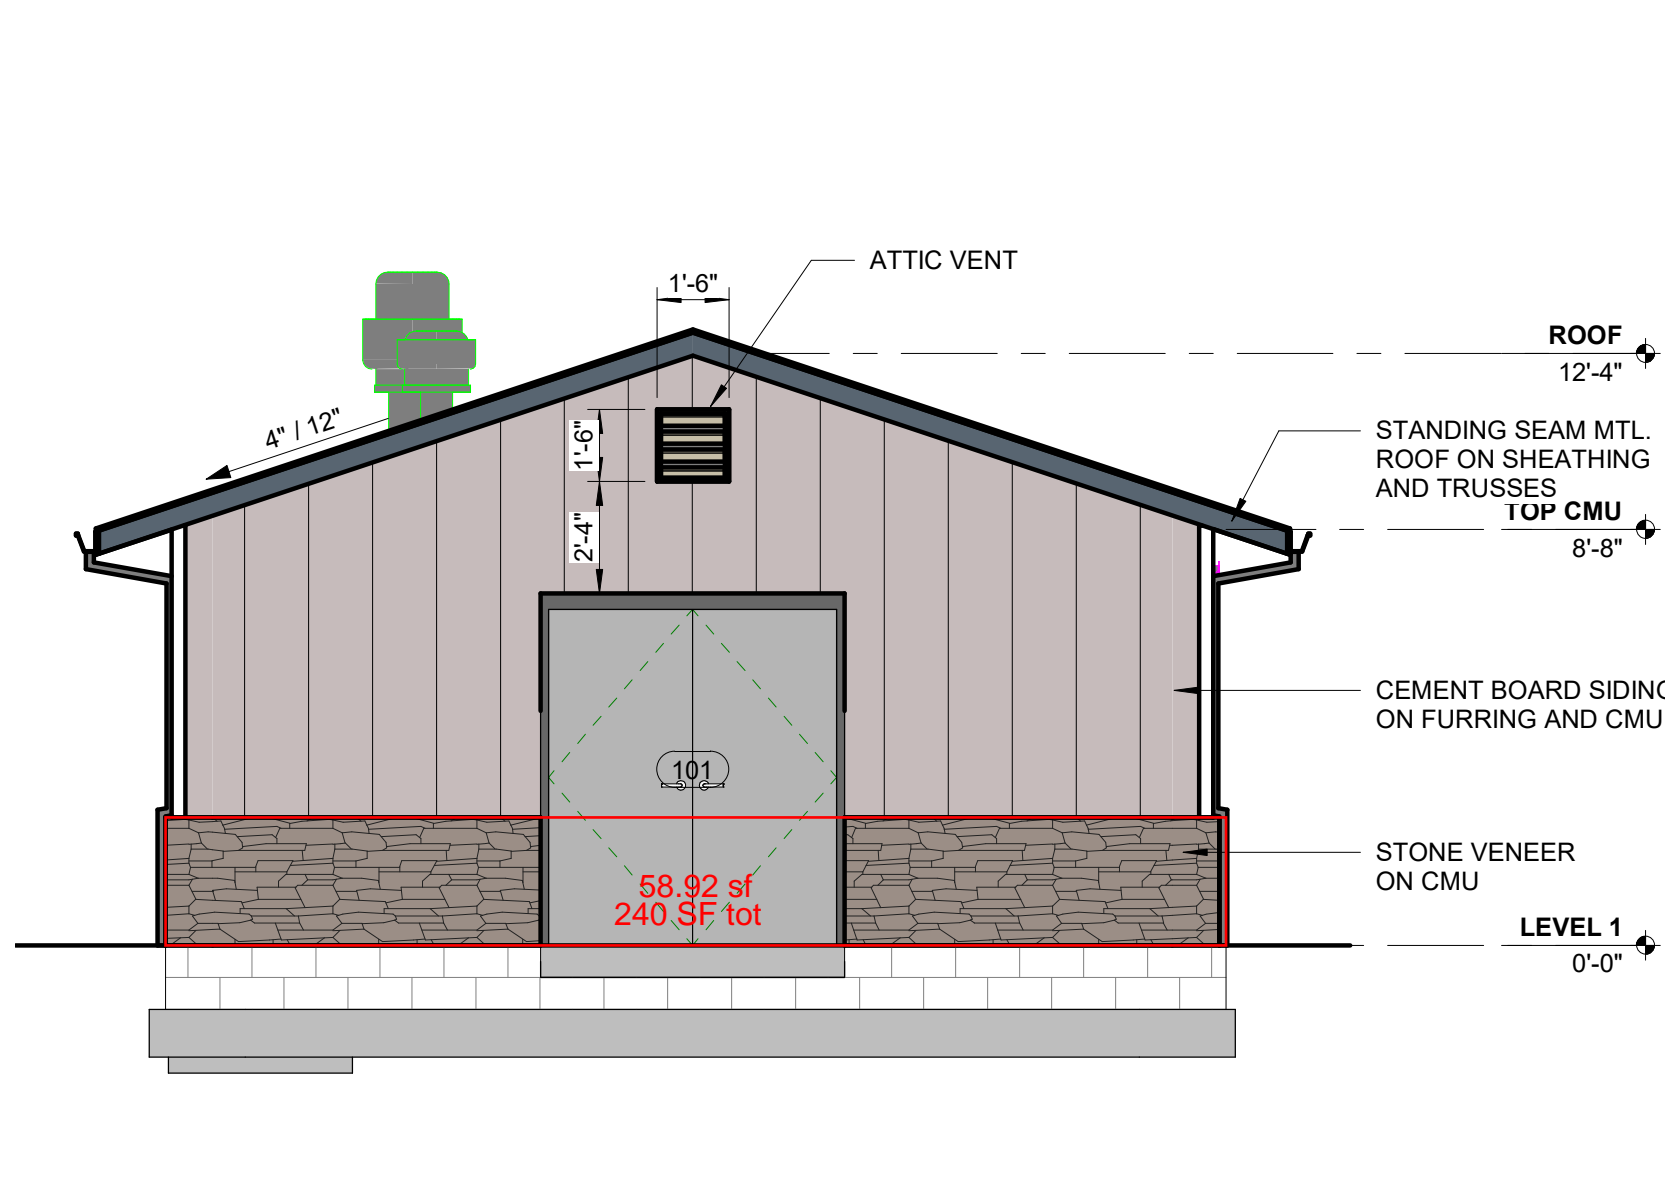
, DUGOUT PLANS AND DETAILS
